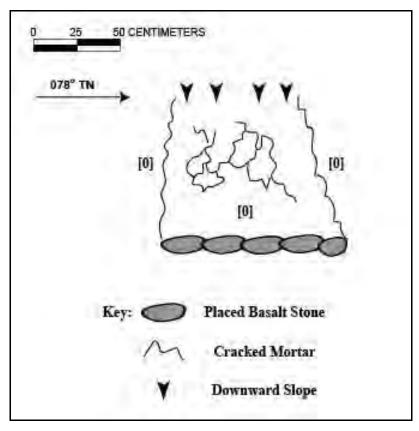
Plan view of CSH 1, walkway with a basalt boulder border
